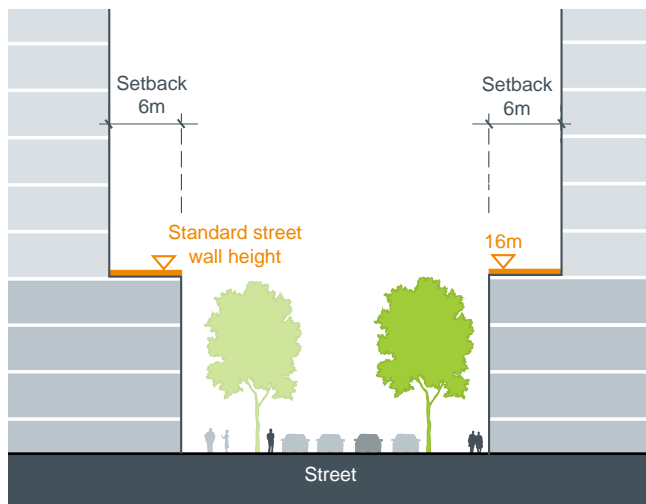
Section showing the typical 16m street wall height and typical 6m upper level setback
